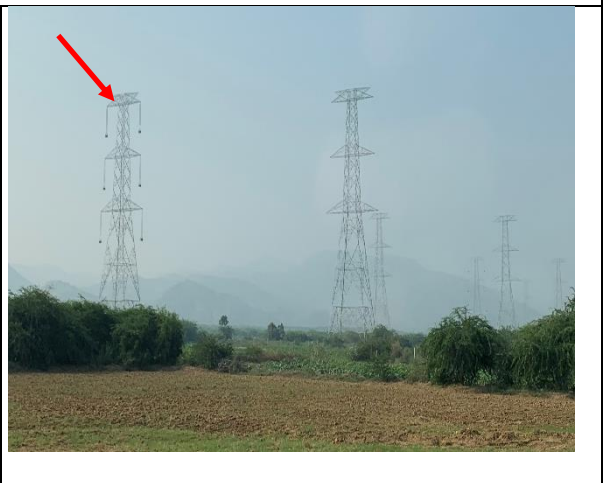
Ongoing Tower Foundation Work (Existing PowerGrid Transmission Line)
